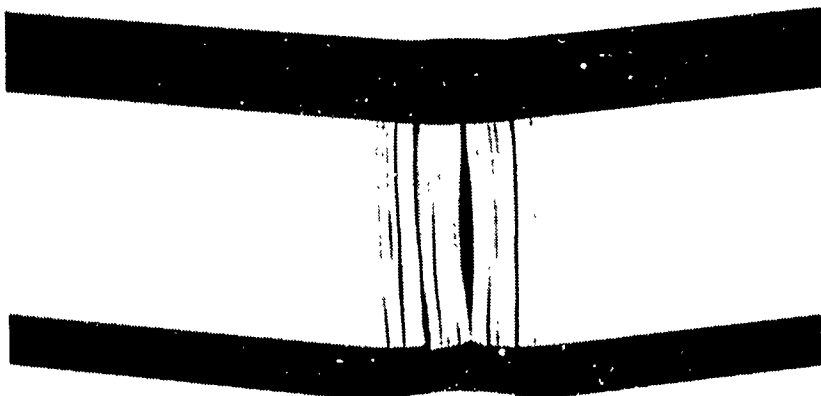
Typical MTS Laminated Beam Specimens after Test.
